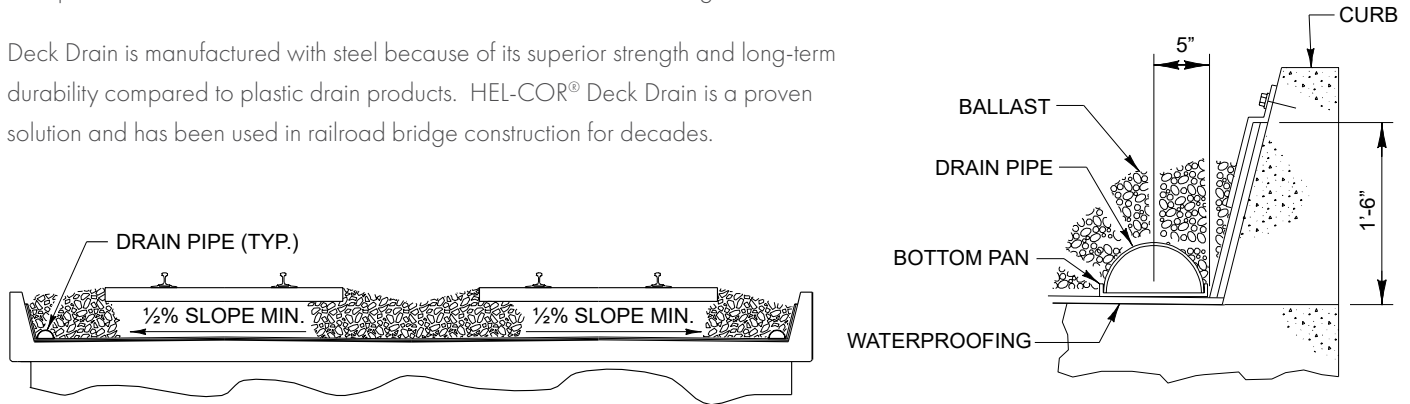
Typical cross section of Deck Drain used for drainage for a railroad bridge.
